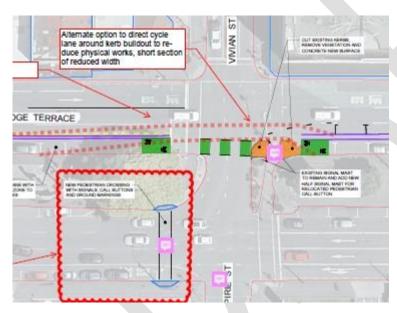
Excerpt from plan - Cambridge Terrace / Vivian Street / Kent Terrace / Pirie Street intersection (C301A)
